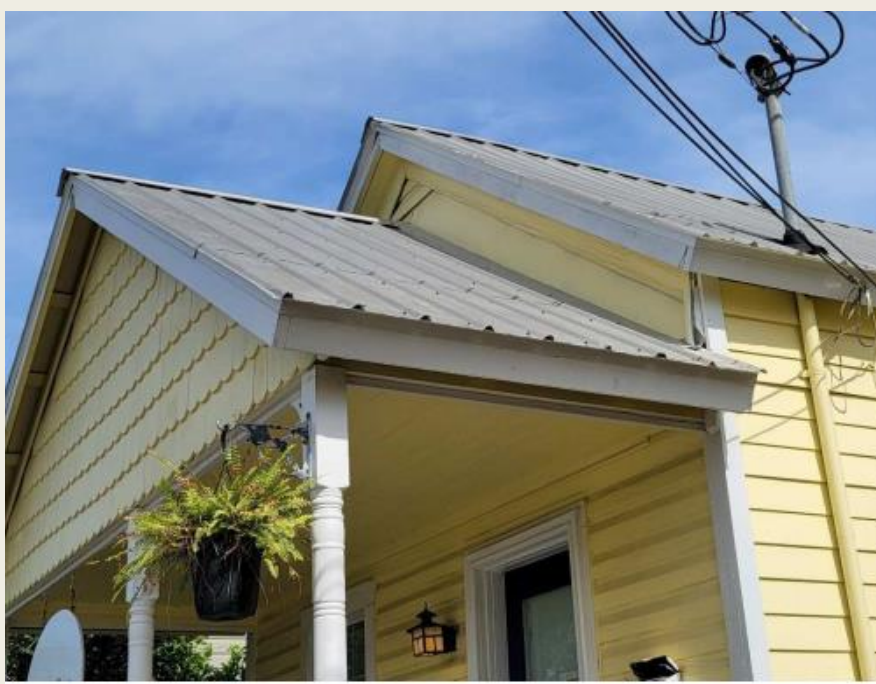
E. Jackson Street and surrounding r-panel roofs.
